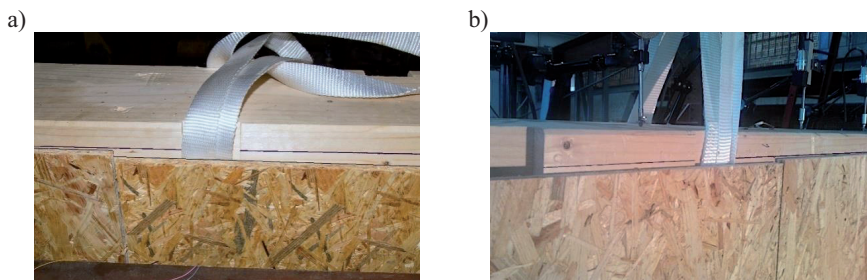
Apparent uplifting of the header with the top plate of wall with opening
